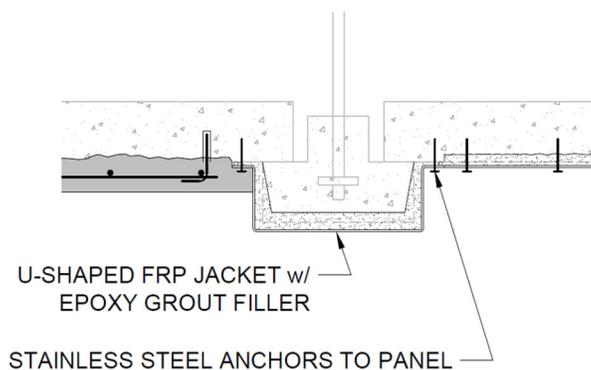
FRP pilaster jacket (shown with concrete and FRP panel facings)
